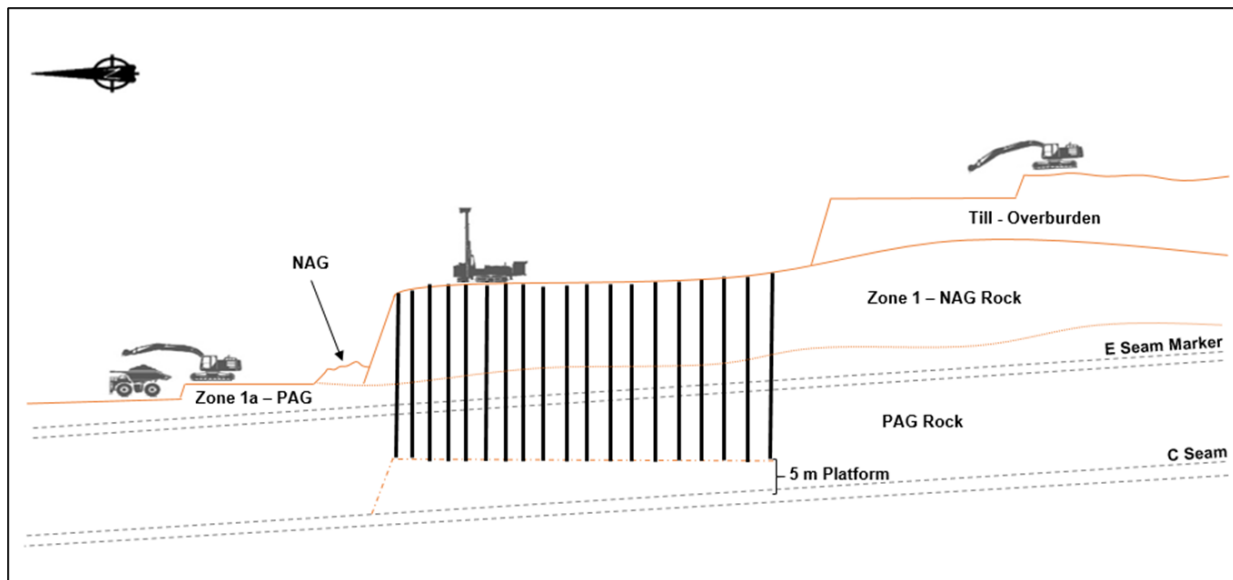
Mining to 4-metre (m) platform above c seam
